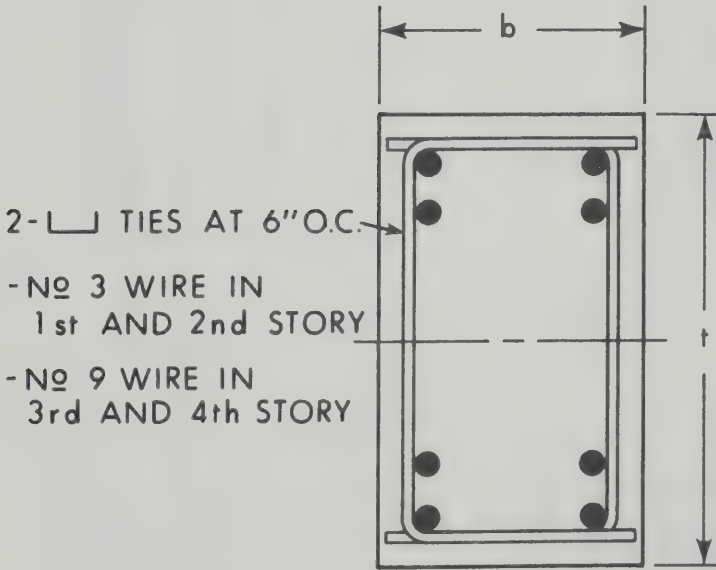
TEST SPECIMEN SHOWING MAIN REINFORCEMENT
